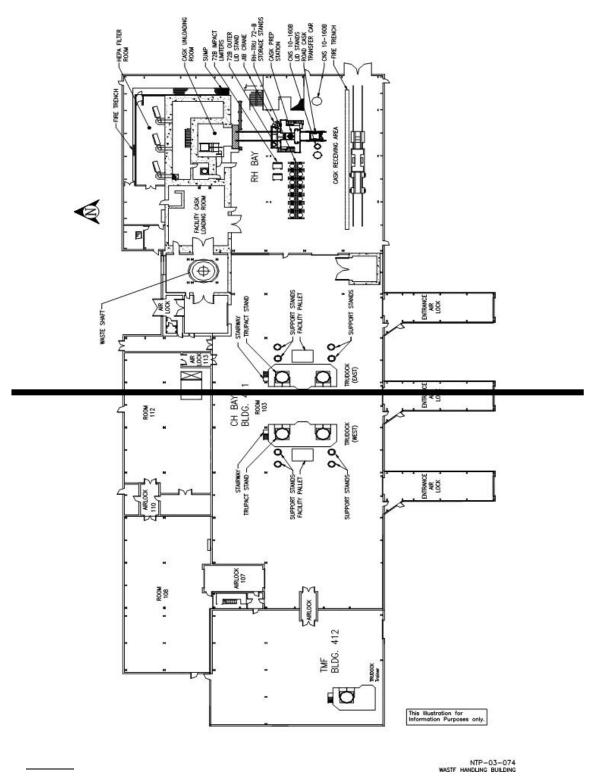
Waste Handling Building Plan (Ground Floor)
